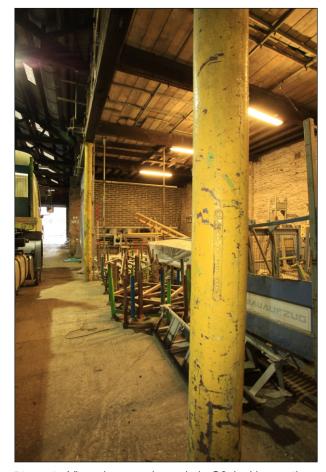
View along a colonnade in G6, looking north (Film 2.32)
